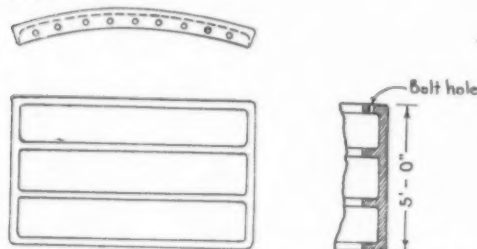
Sections of German type of tubing made with internal flanges and connected by heavy bolts.
